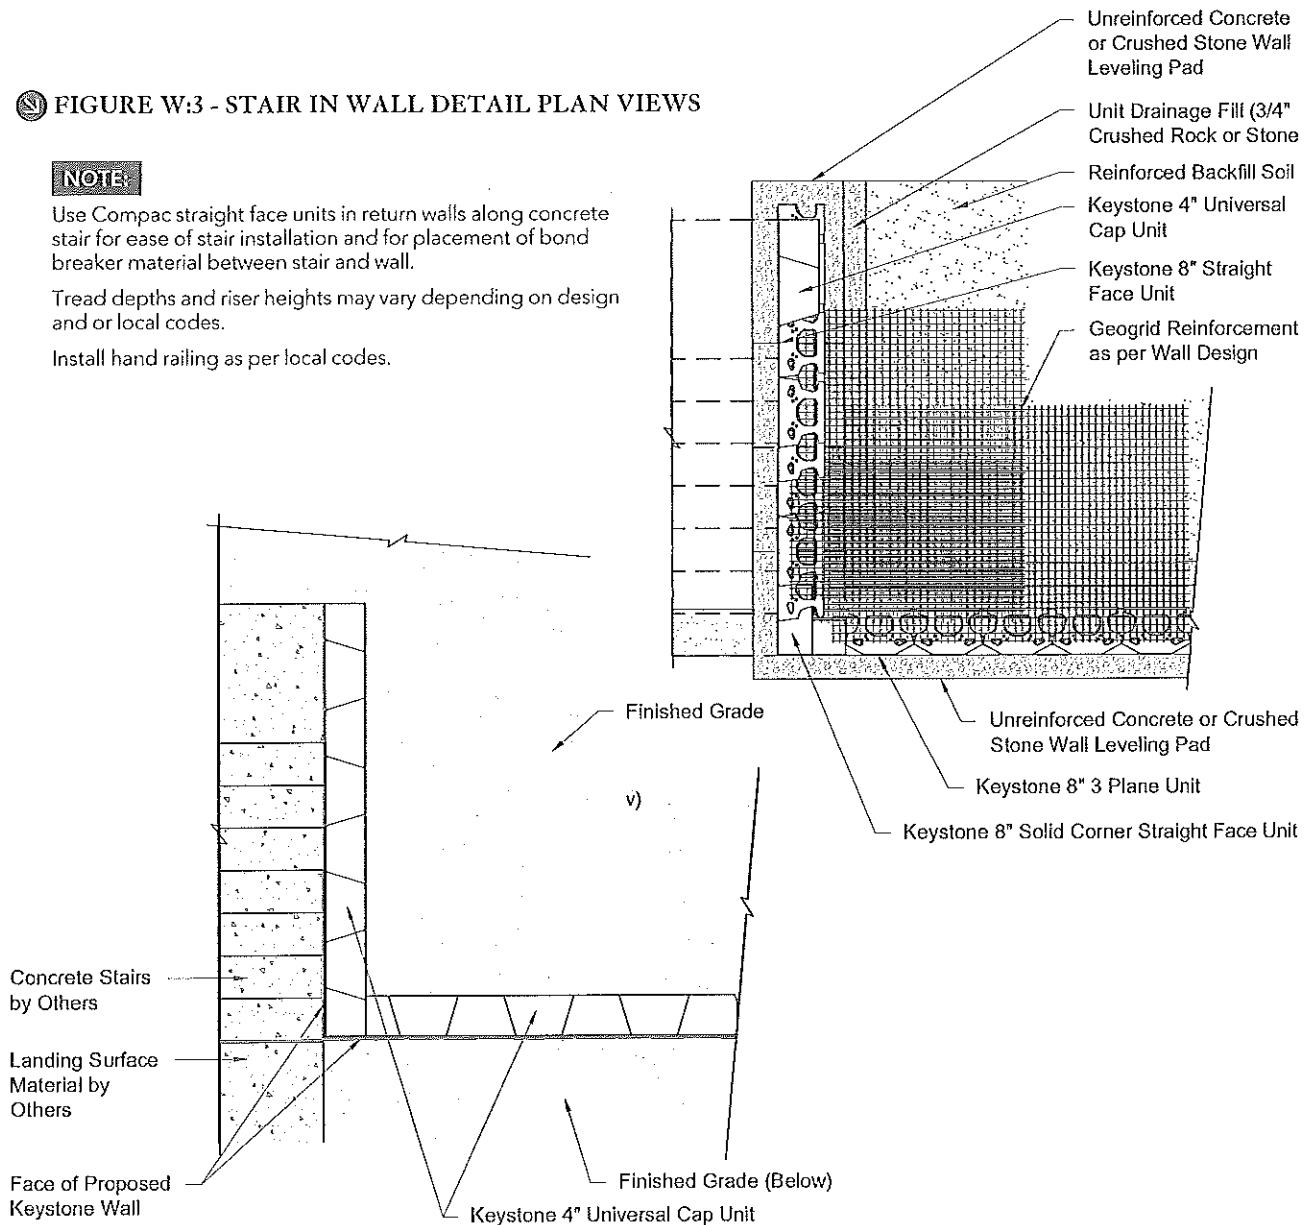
STAIR IN WALL DETAIL PLAN VIEWS
